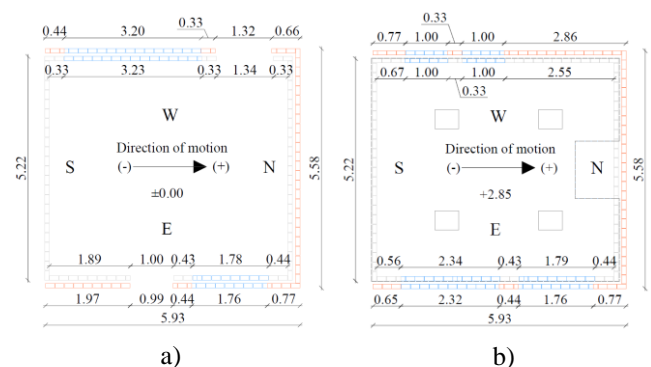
Plan views of the prototypes: a) first storey; b) second storey. Units of m.
